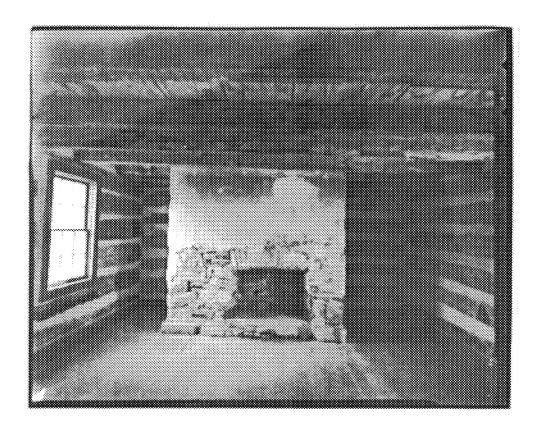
Hampton Quarter 1, first floor: view of northwest fireplace wall in southeast room looking northwest.
